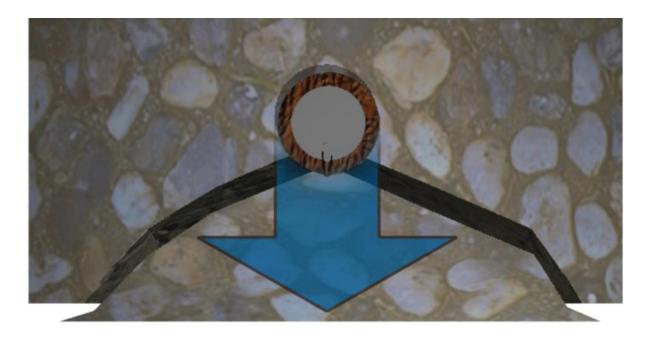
Concrete spalling mechanism involving corroding reinforcing steel bars
